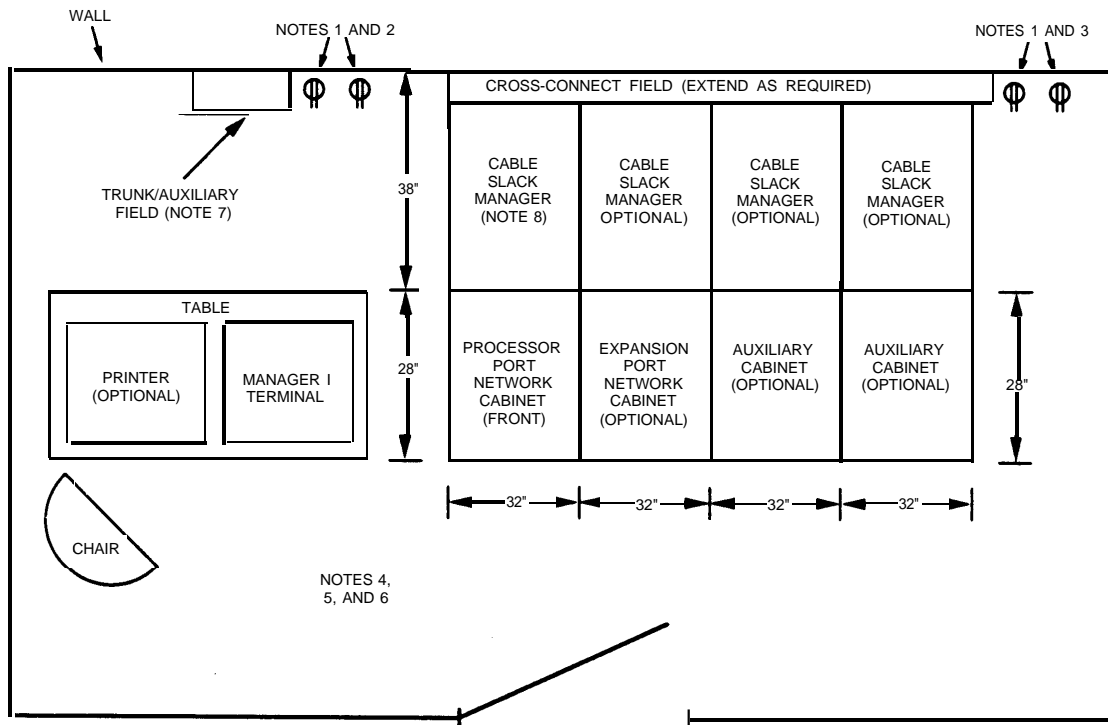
Typical Multicarrier Cabinet Floor Plan
